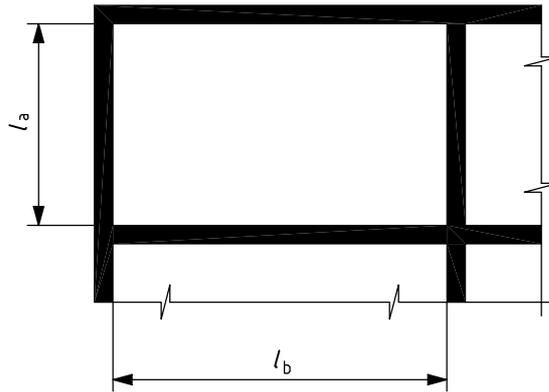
Corner panel of two-way slabs supported on girders, beams or structural concrete walls
